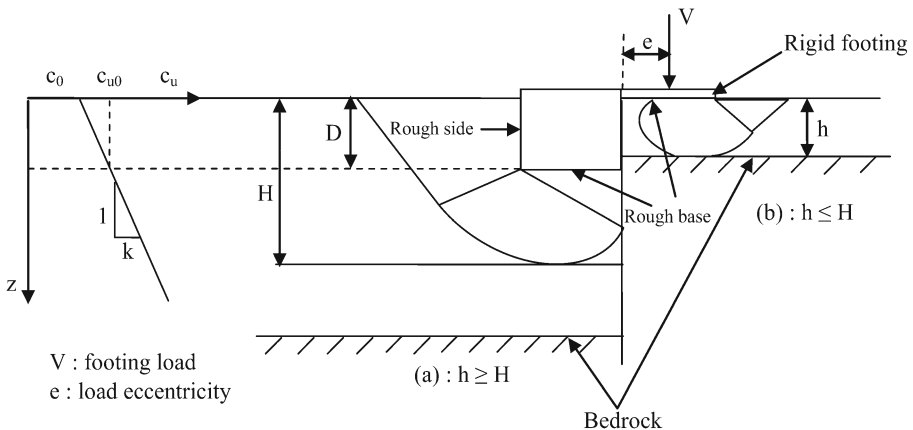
Problem geometry. (a): Embedded footing and (b): surface footing
